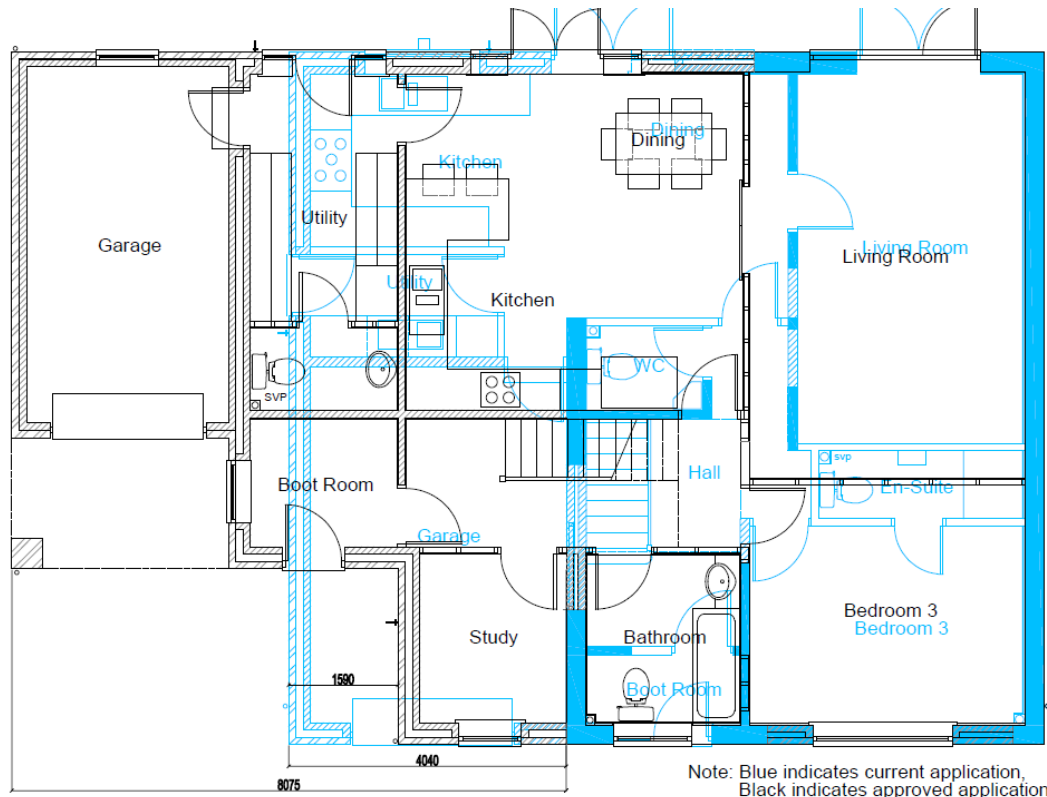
Previously approved floor plan (black line) v 'as built' floor plan (blue lines)
